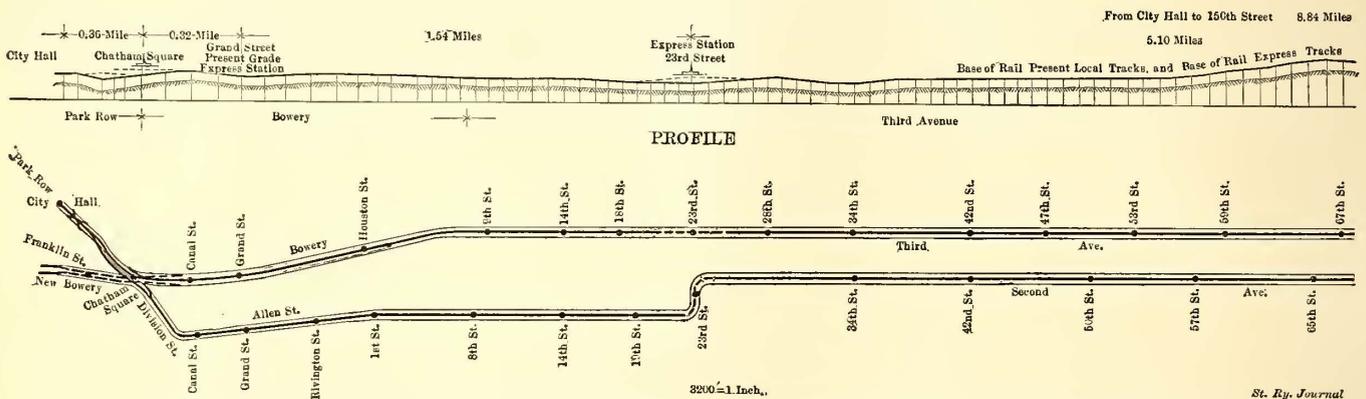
PROFILE AND PLAN OF PROPOSED EXPRESS TRACKS ON PRESENT EAST SIDE ELEVATED RAILWAYS
